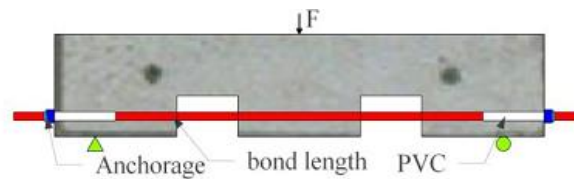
Schematic representation of beam anchorage specimen for bond testing
